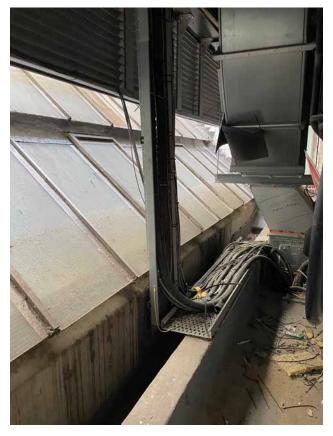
Glazed roof (north side) with gutter behind conrete parapet (DIA)
